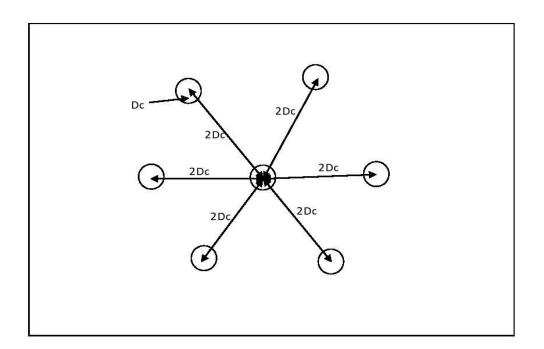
Six columns are at a radial distance 2Dc from central column
